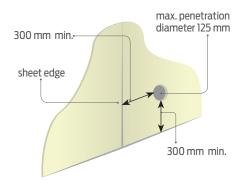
Manufacturer limits on larger penetrations in one plasterboard system.
